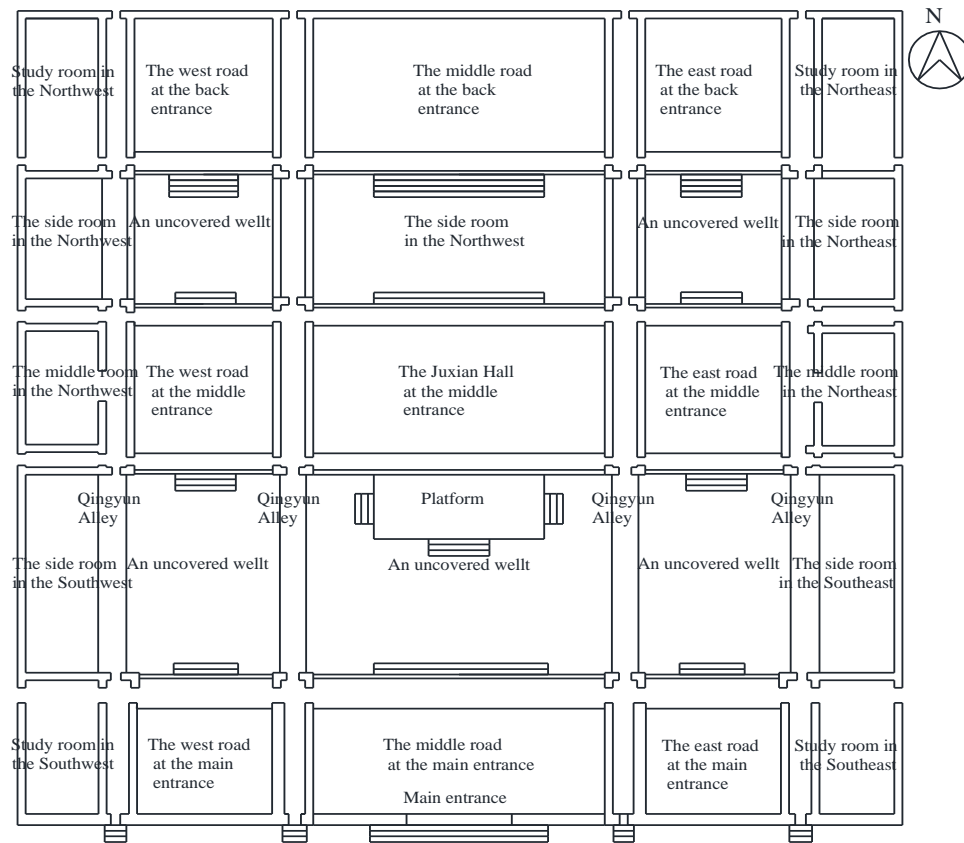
The Floor Plan of Chen Ancestral Temple in Guangzhou
